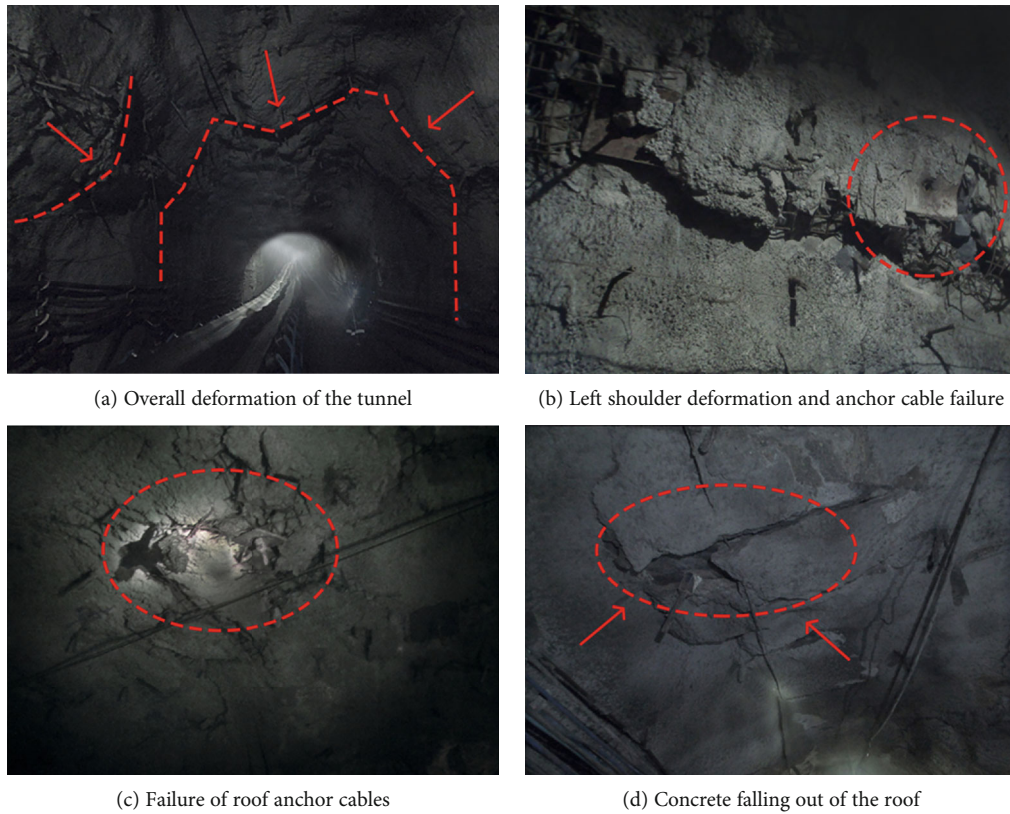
Roadway deformation and failure of anchor cables diagram.
